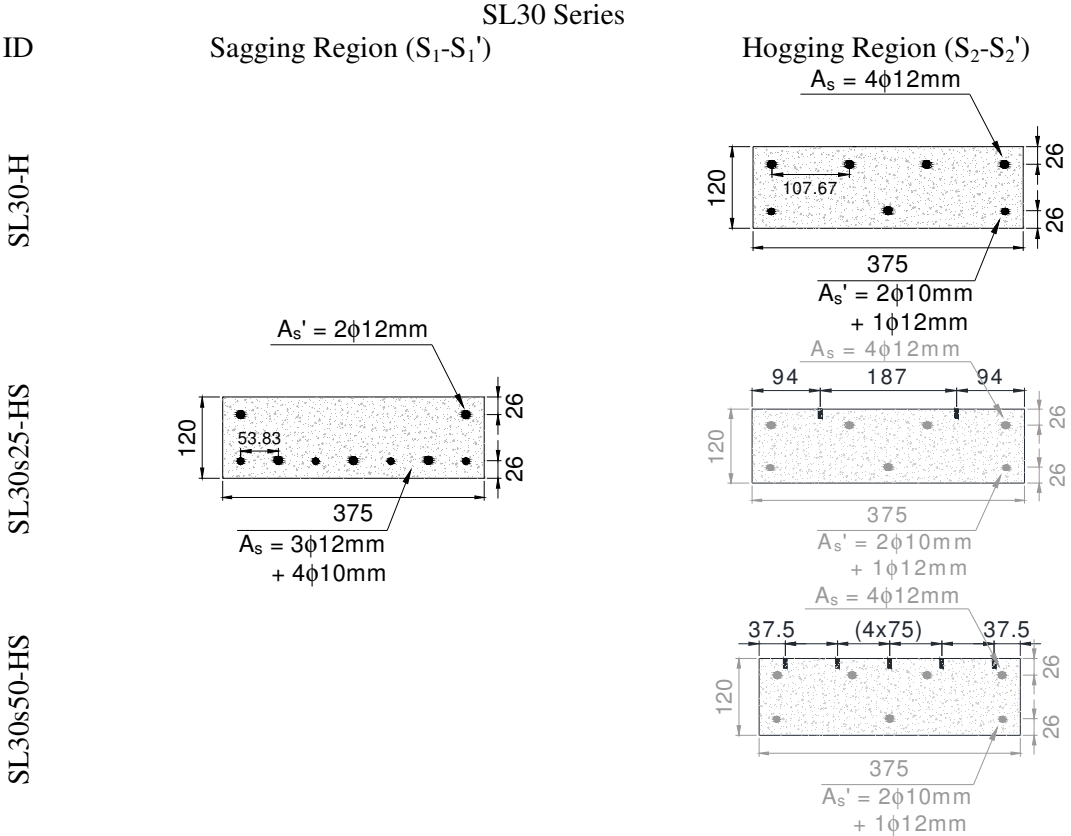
Slab strips of SL30-H Series: specimen's cross-sectional dimensions, reinforcement and strengthening of sagging (S₁-S₁') and hogging regions (S₂-S₂'). Dimensions in mm.
